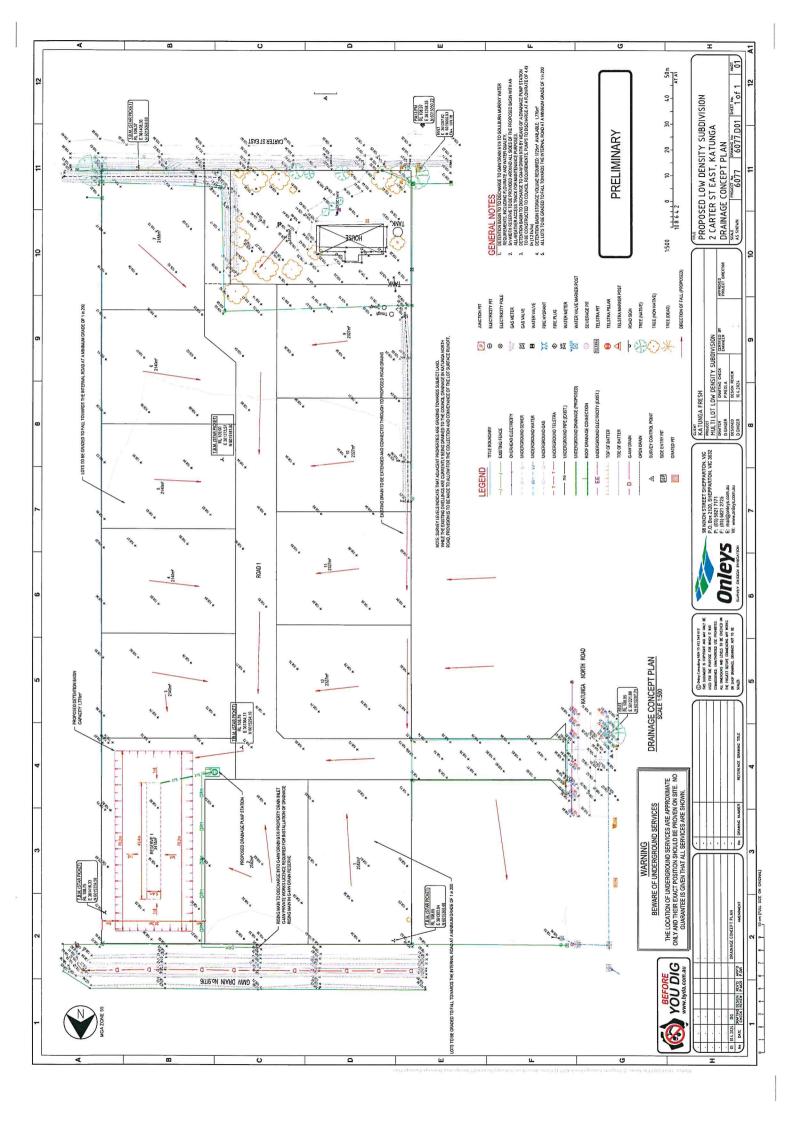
D01 6077 – Proposed Plan of Subdivision
